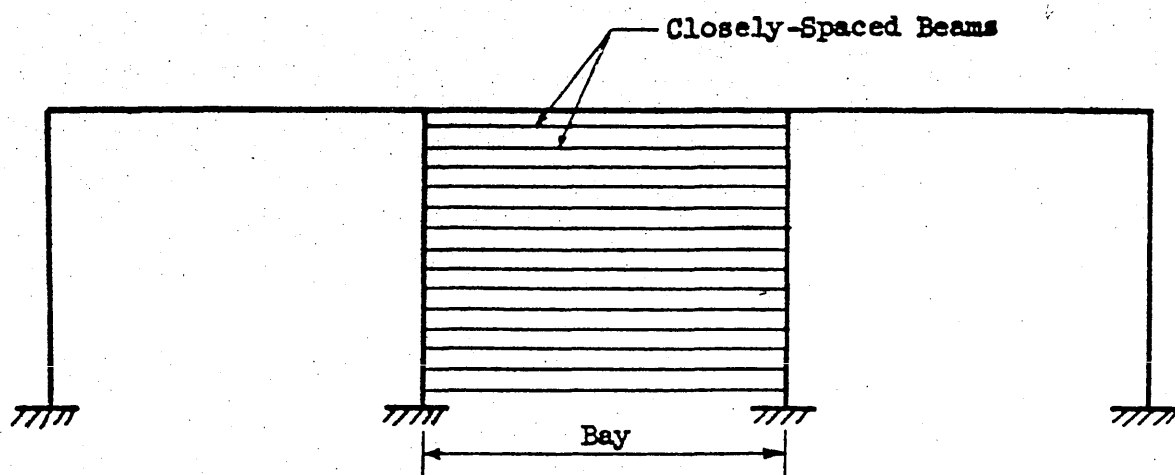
Typical Bay with Nest of Beams Approximating Wall Covering
